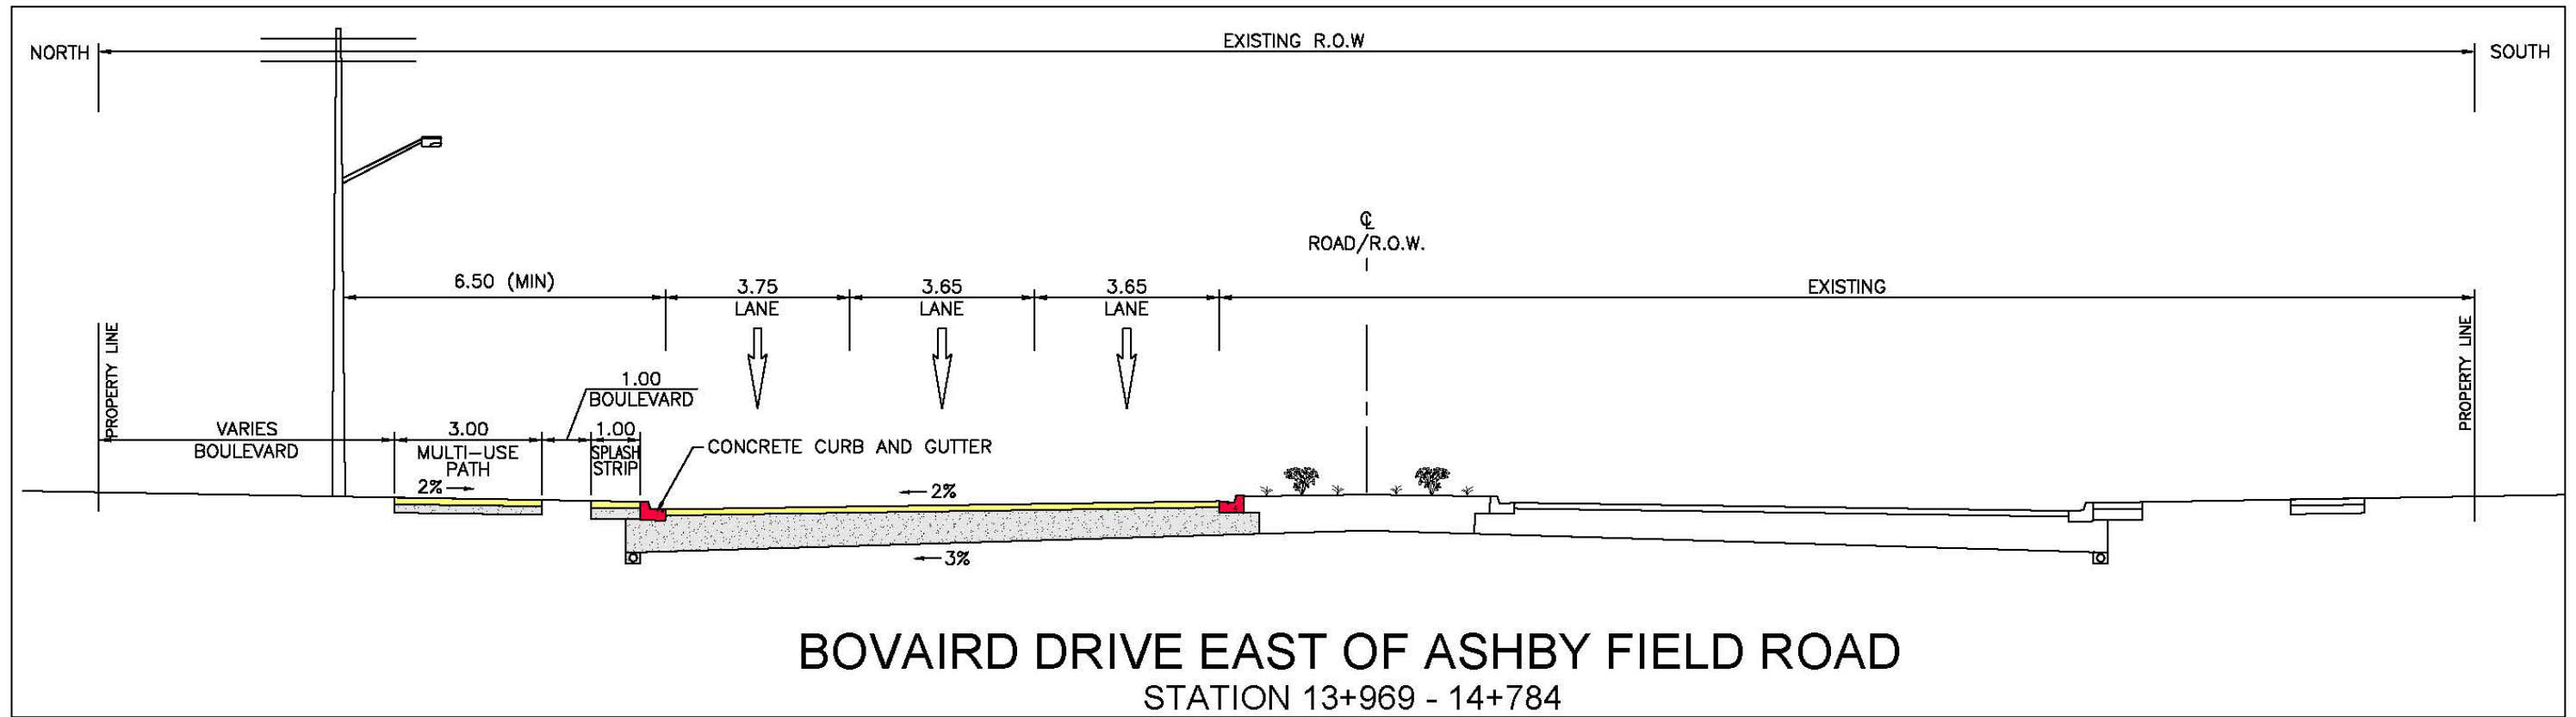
Typical Cross Section – East of Ashby Field Road
